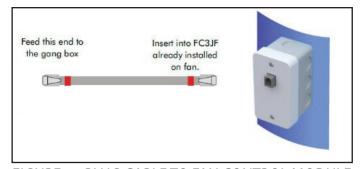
PLUG CABLE TO FAN CONTROL MODULE
